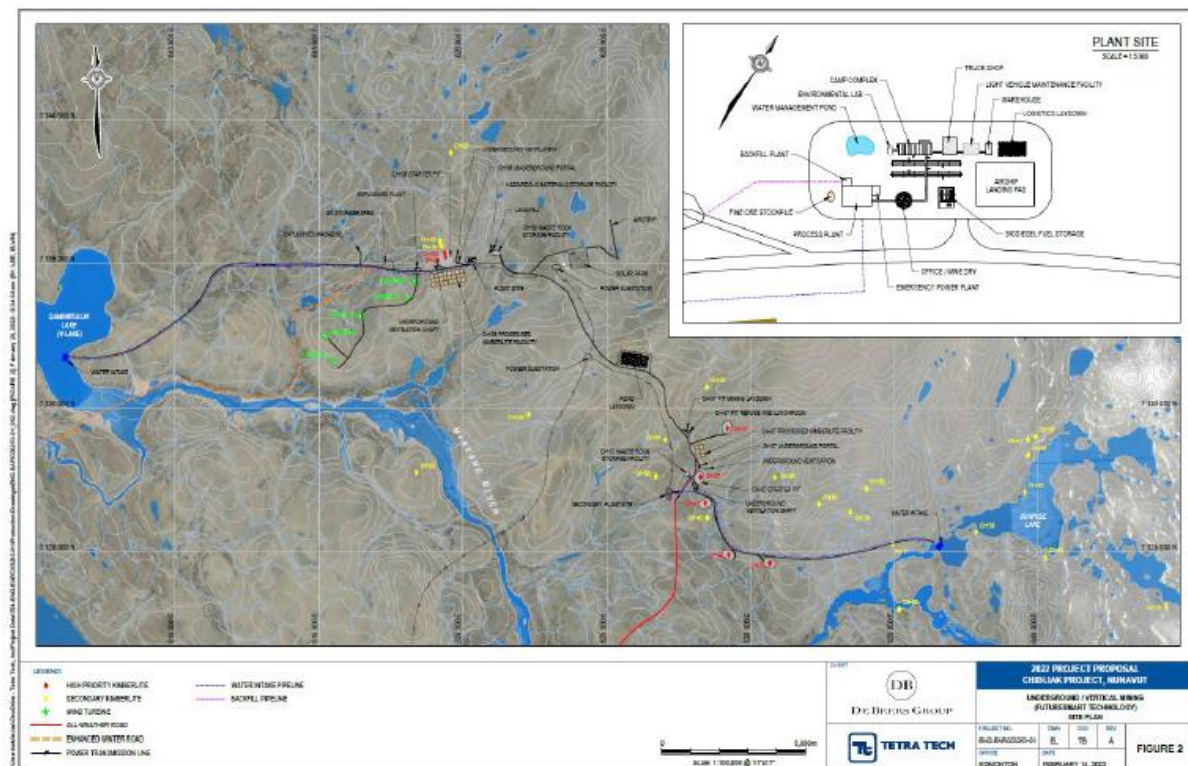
Conceptual Layout of Project Infrastructure Associated with the Underground/Vertical Mining Method
